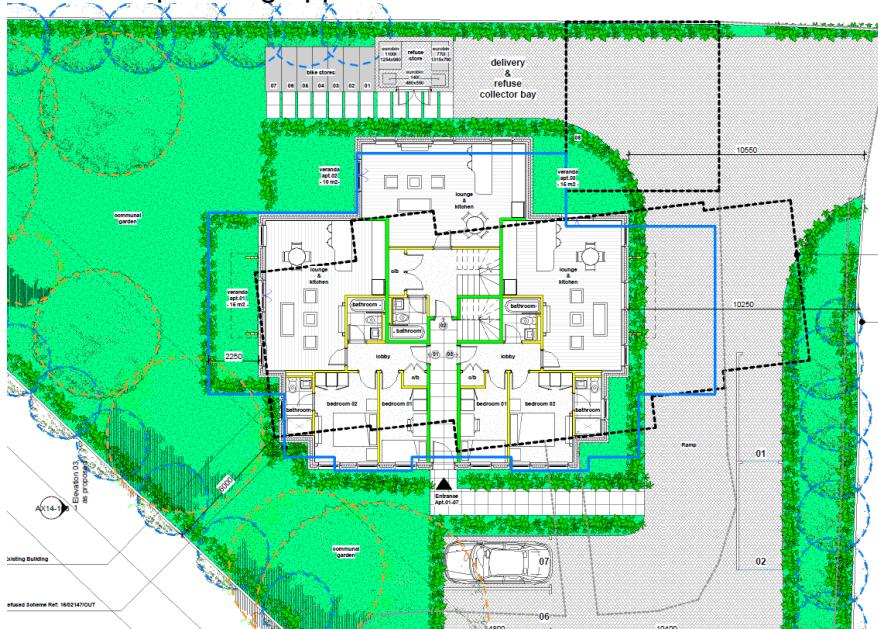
Elevation plans of the allowed scheme at 132 Crofton Road/Middlewood Court and dotted lines in block colour represent the former houses
